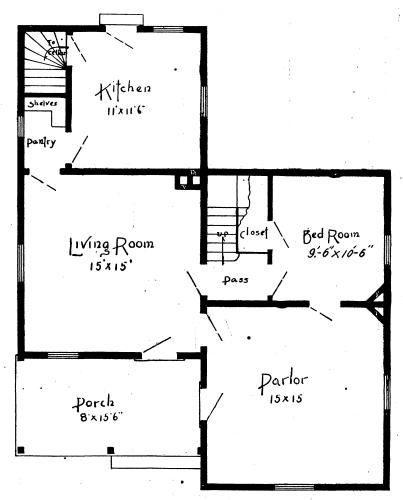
First floor of \$600 farm house with \$500 addition. (Design No. 1.)
